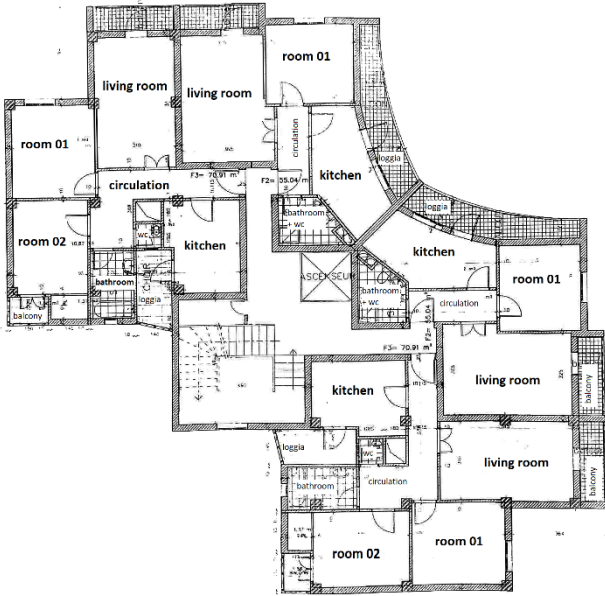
Floor plan F3 and F2—angular block. (Source: OPGI, 2023)
